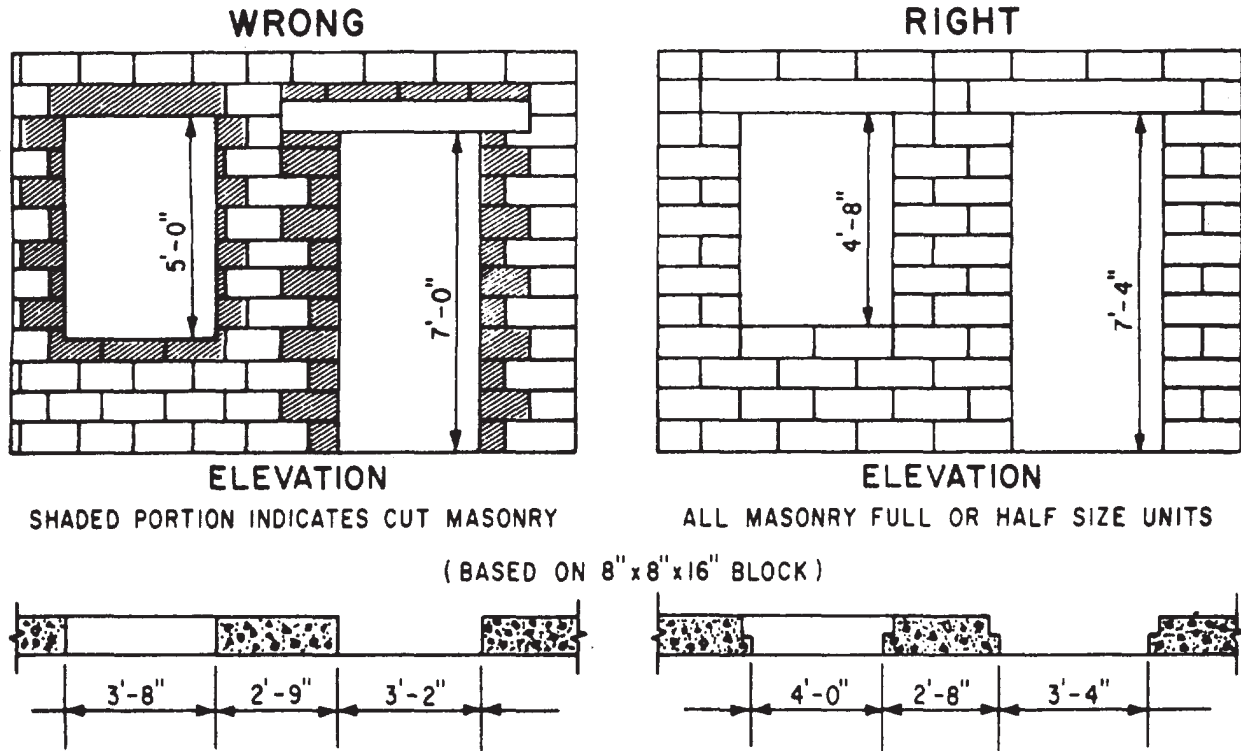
Use of modular dimensions in concrete masonry wall openings.
